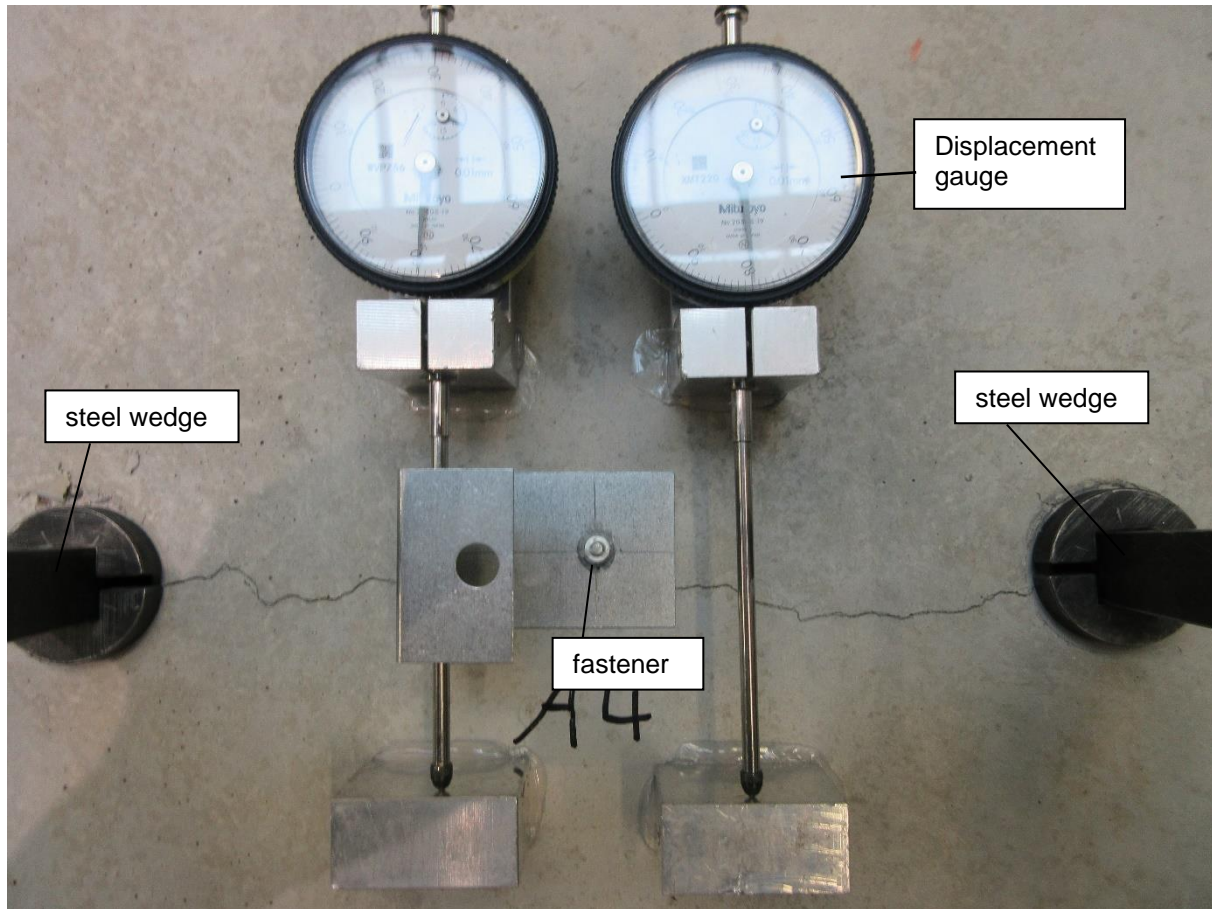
Measurement of crack width in case of tension and shear loads
